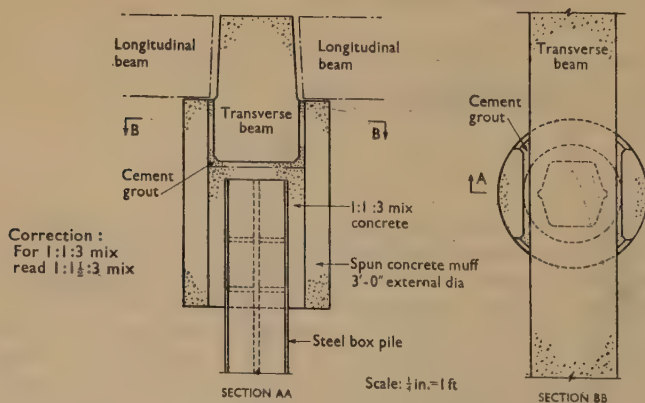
DETAILS OF PILE-MUFF CONNEXION
